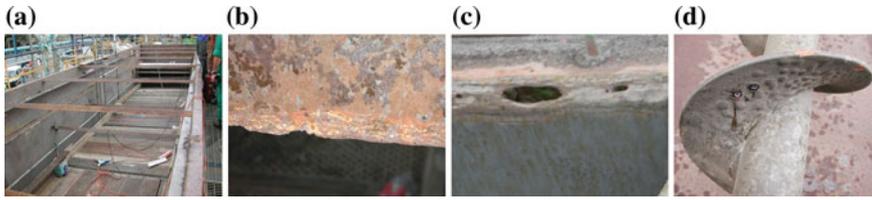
a General view of DGF pool. b The upper corroded beam in the pool. c Corrosion holes in the DGF pool construction. d Large blisters in epoxy coating on impeller snail
